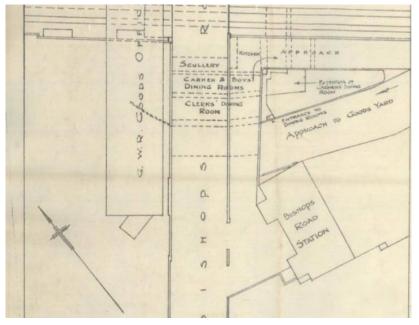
Original layout of PIP Triangle prior to 1930s alterations (source: G.W.R. Paddington Goods Depot: Extension of Carmen' Dining Room, Architectural Department 1928)
